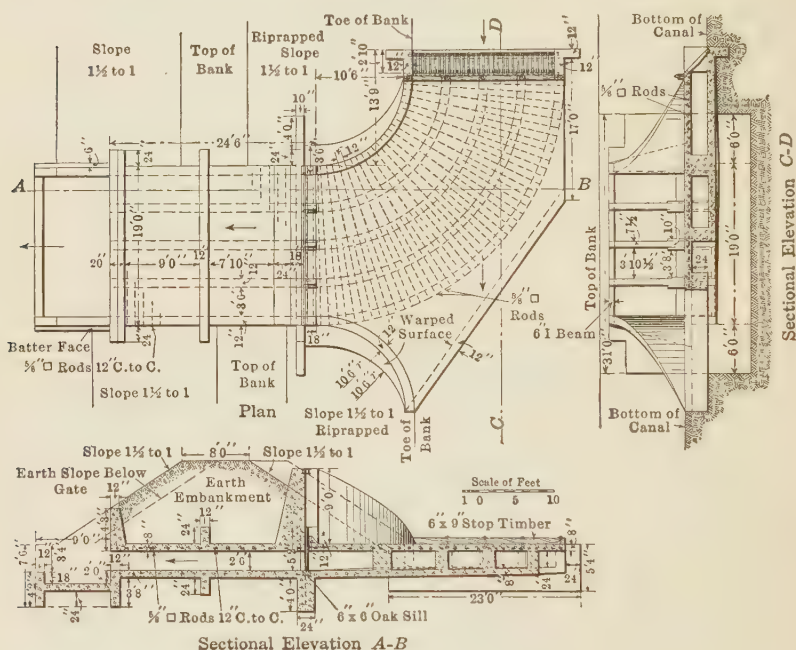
Sand trap sluiceway on Leasburg Canal.
